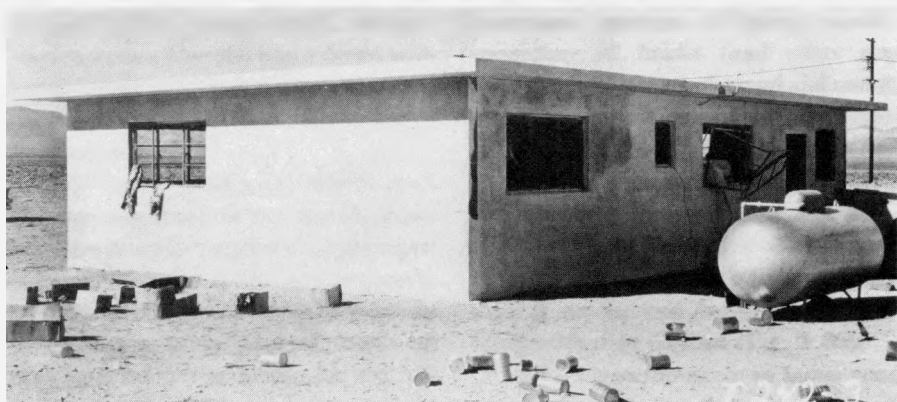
Reinforced precast concrete house after a nuclear explosion (5 psi peak overpressure). The LP-gas tank, sheltered by the house, is essentially undamaged.
